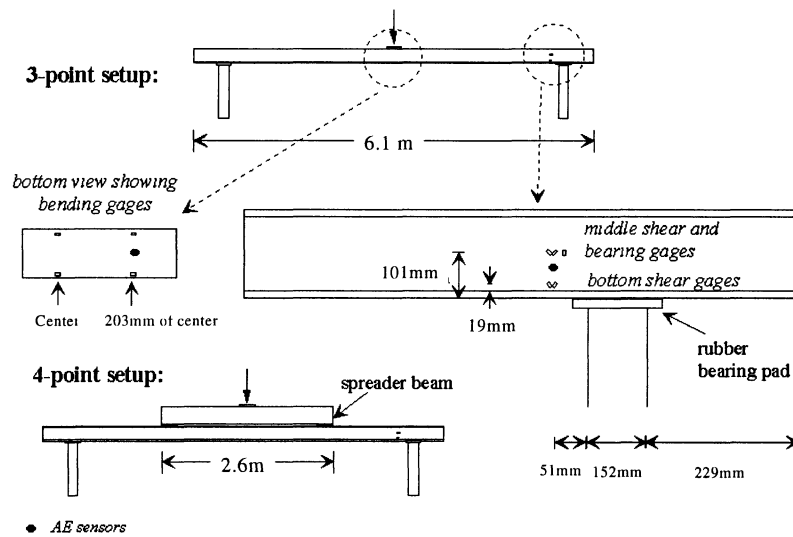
Schematic of proof test configurations used for individual beams indicating the location of AE sensors.
